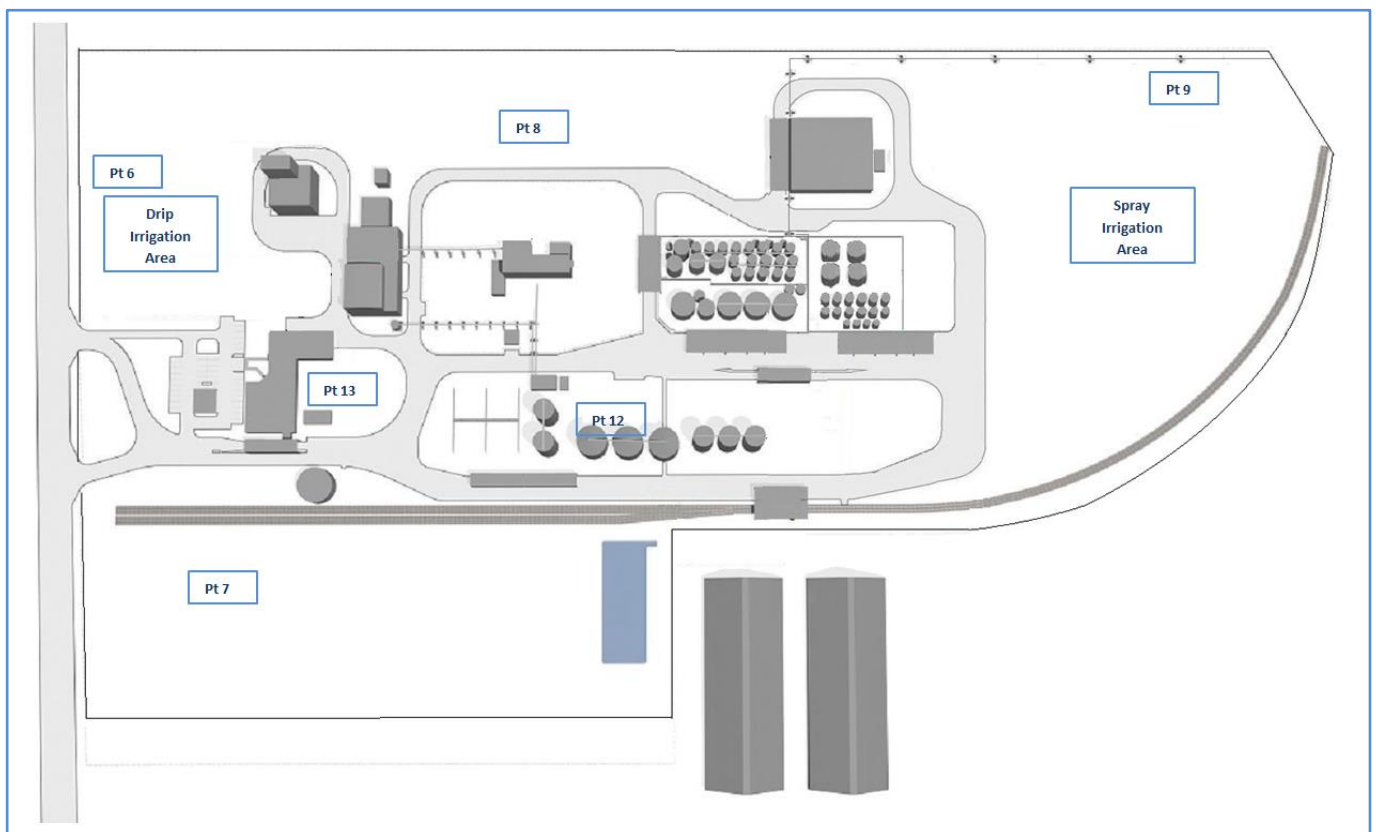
Cargill site layout and location of monitoring points and irrigation locations
